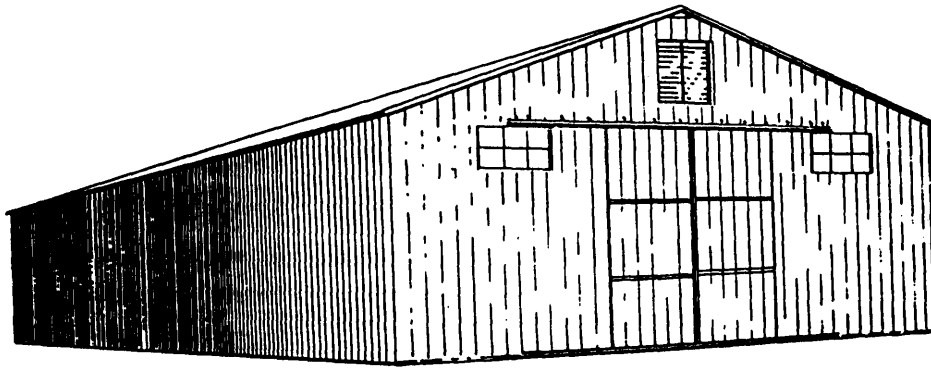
Completed 40' x 100' x 14' preengineered metal building.
